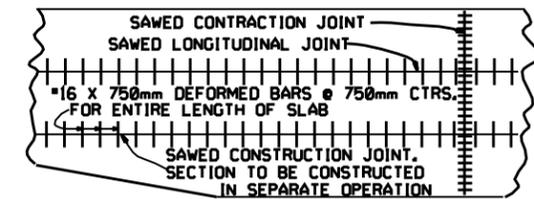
DETAIL OF SAWED LONGITUDINAL JOINT AND LONGITUDINAL CONSTRUCTION JOINT
